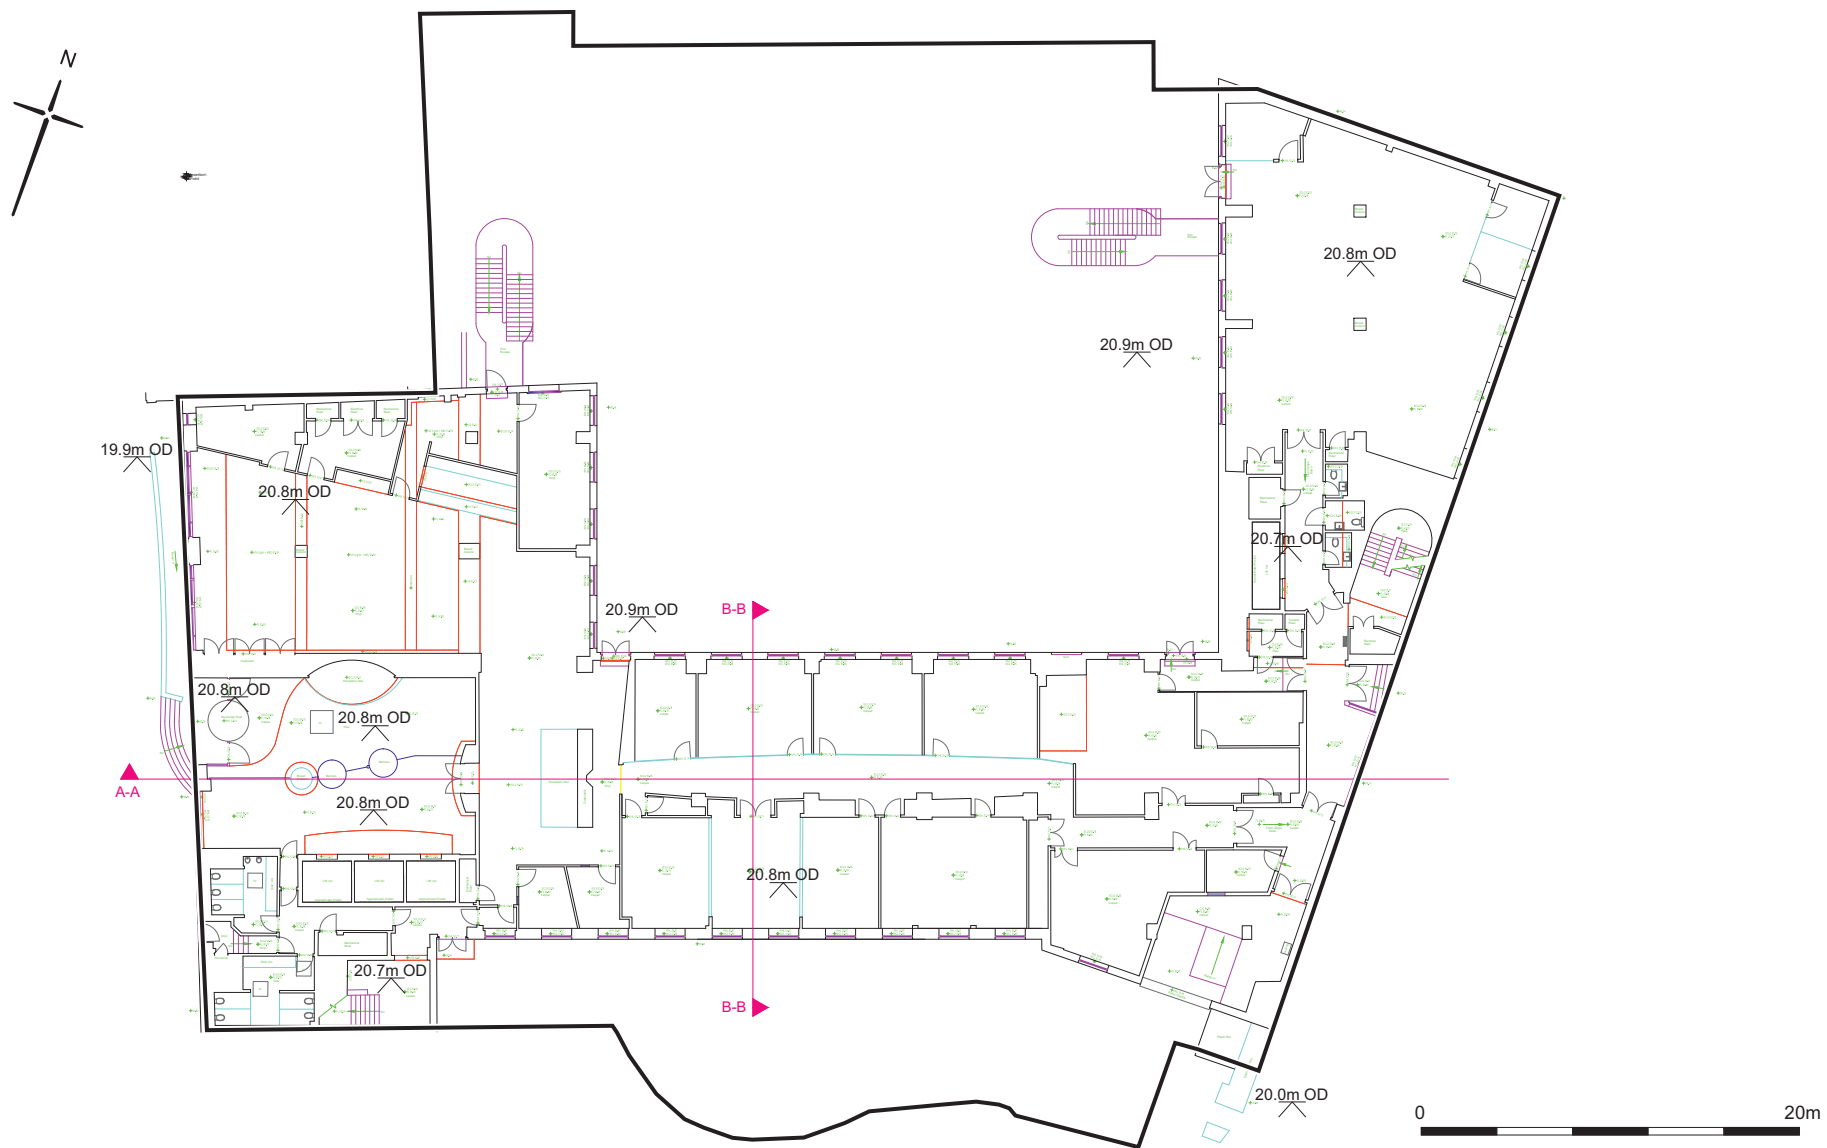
Plan of existing ground floor (Omega Geomatics, dwg no. 3/10, April 2011)
